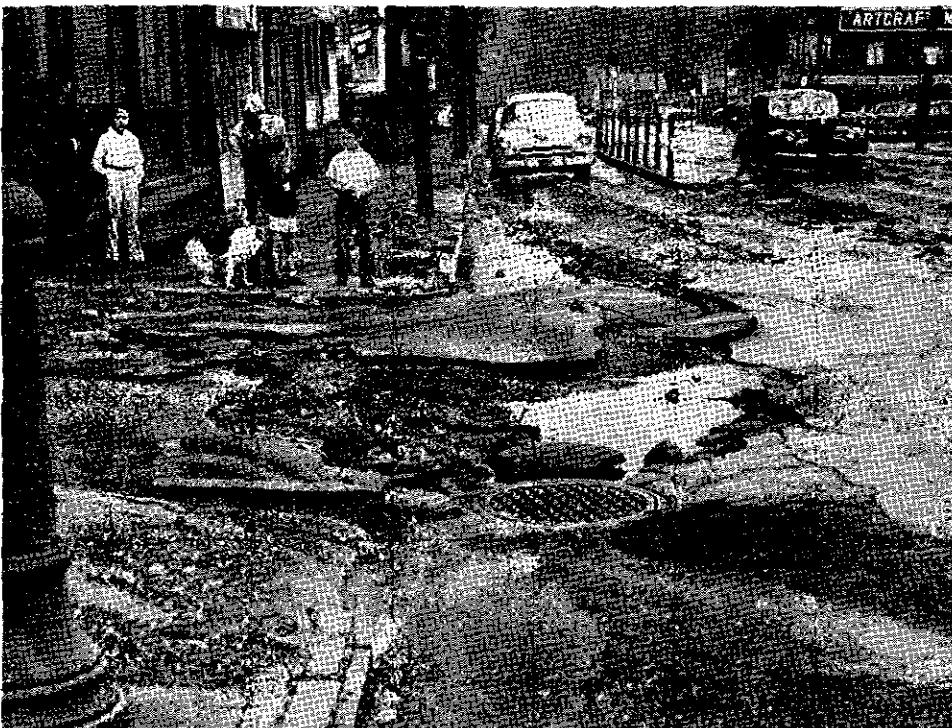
Fig. K - Pavement in Pittsburgh damaged by water
